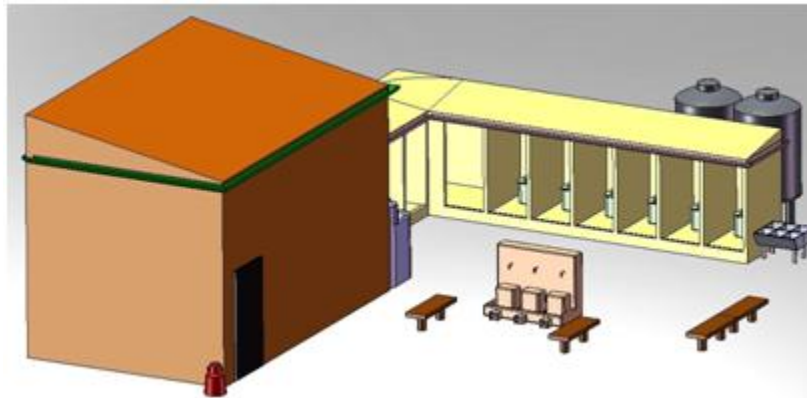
Proposed Site Layout (Granfone *et al.*, 2008)
